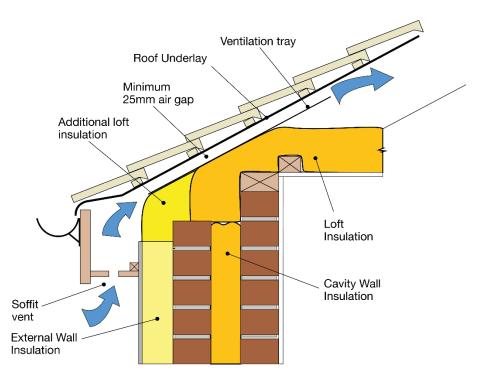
Standard Eaves with Roofline Extension to provide suitable overhang whilst maintaining adequate loft ventilation with additional loft insulation added to mitigate the thermal bridge on the outer brick leaf.
